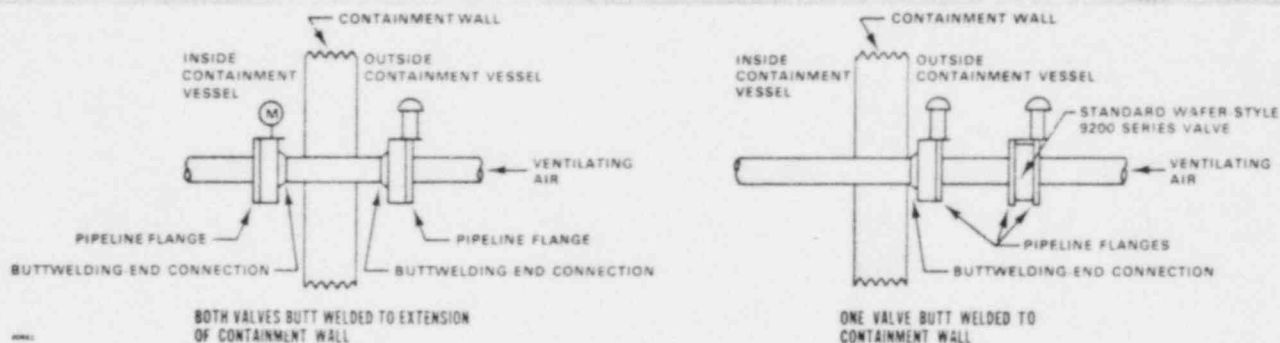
Typical Installations for Single-Flange 9200 Series Valves with One Butt-Welding-End Connection and One Flanged Connection (Being Used as Isolation Containment Valves in Ventilating Air System)
